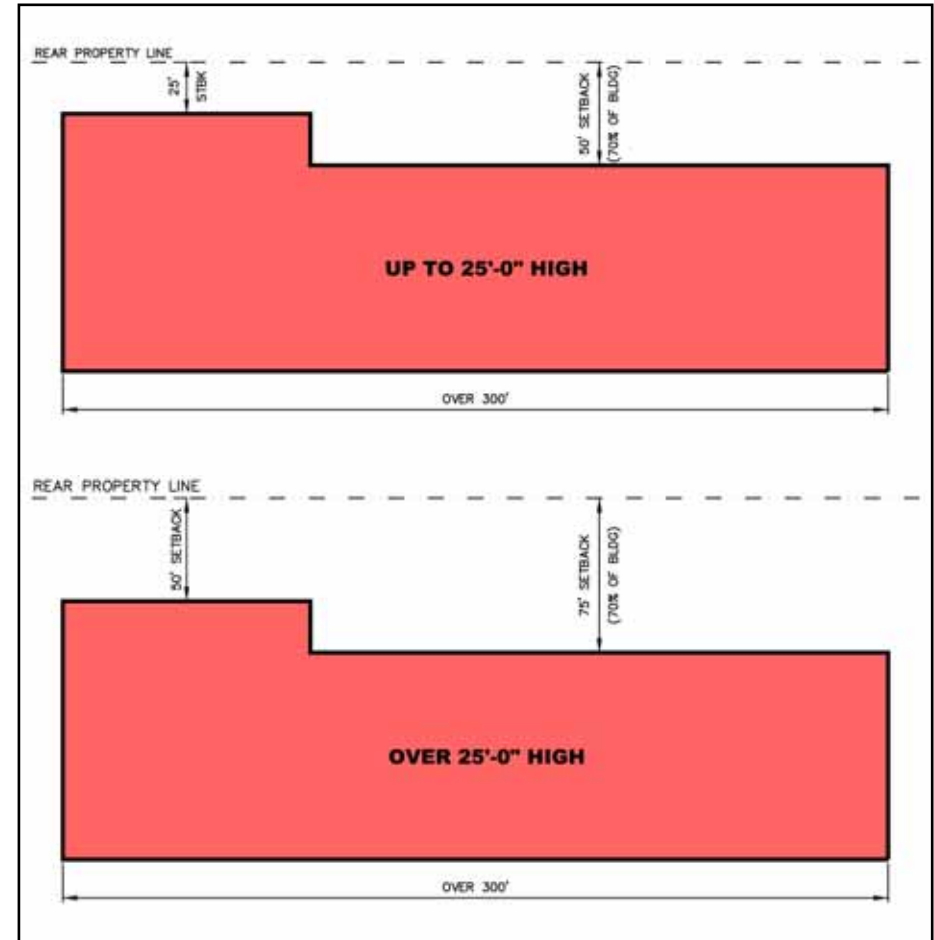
Setbacks for Buildings over 300’ wide on East side of Federal Highway
